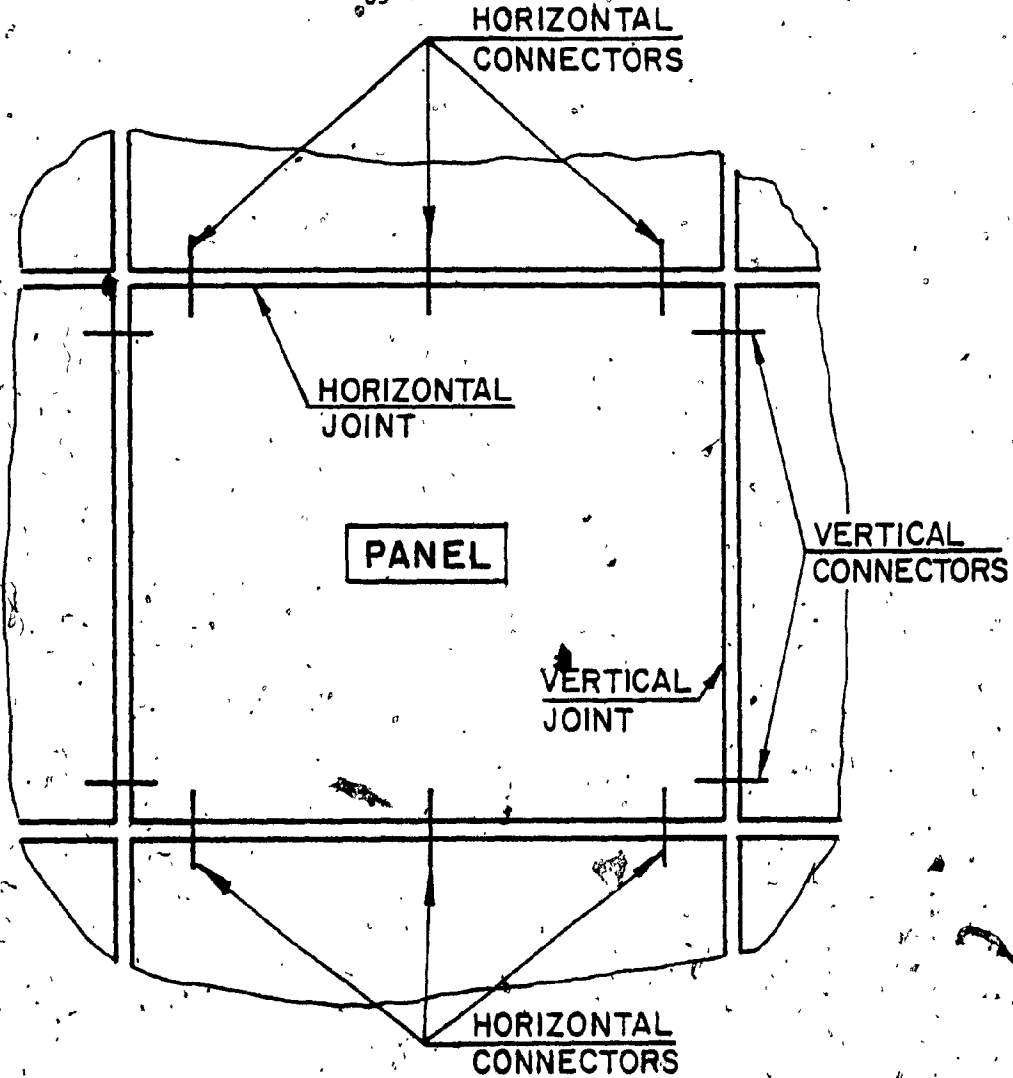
HORIZONTAL AND VERTICAL CONNECTOR ARRANGEMENT
